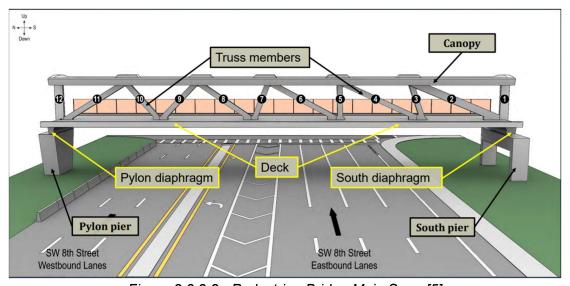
Pedestrian Bridge Main Span [5]
